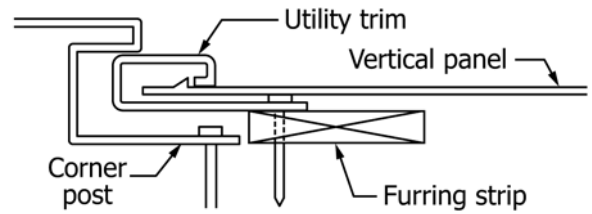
Corner Installation with Panel Cut on Flat Surface
